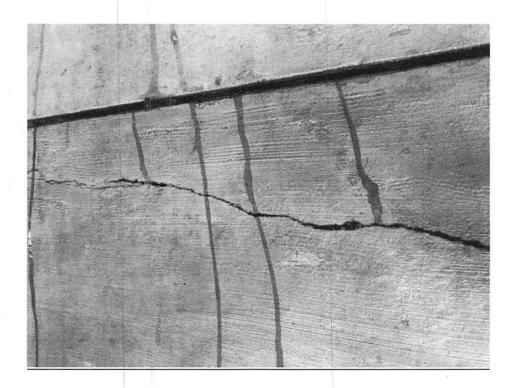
Slab cracks along the sides of a soffit beam.
